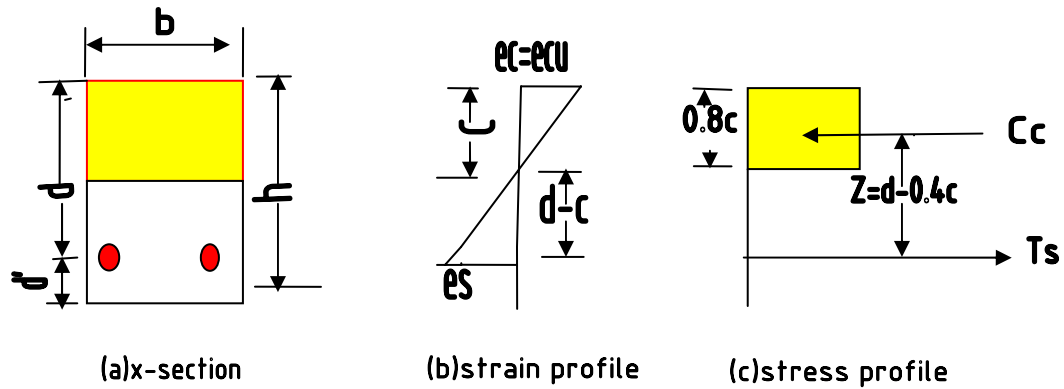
Stress and Strain Profile for Precast Concrete Block.
